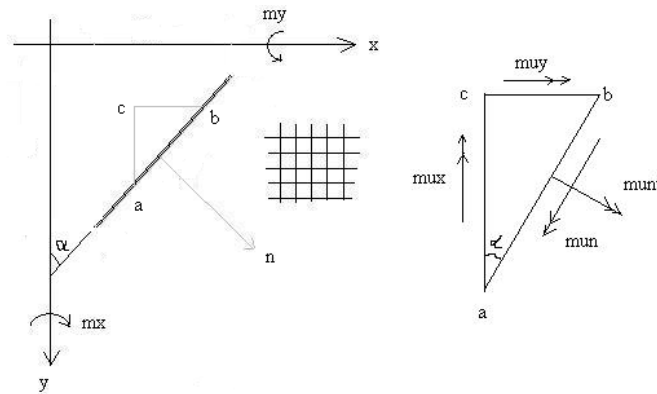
Moments acting on triangular element of reinforced concrete slab
